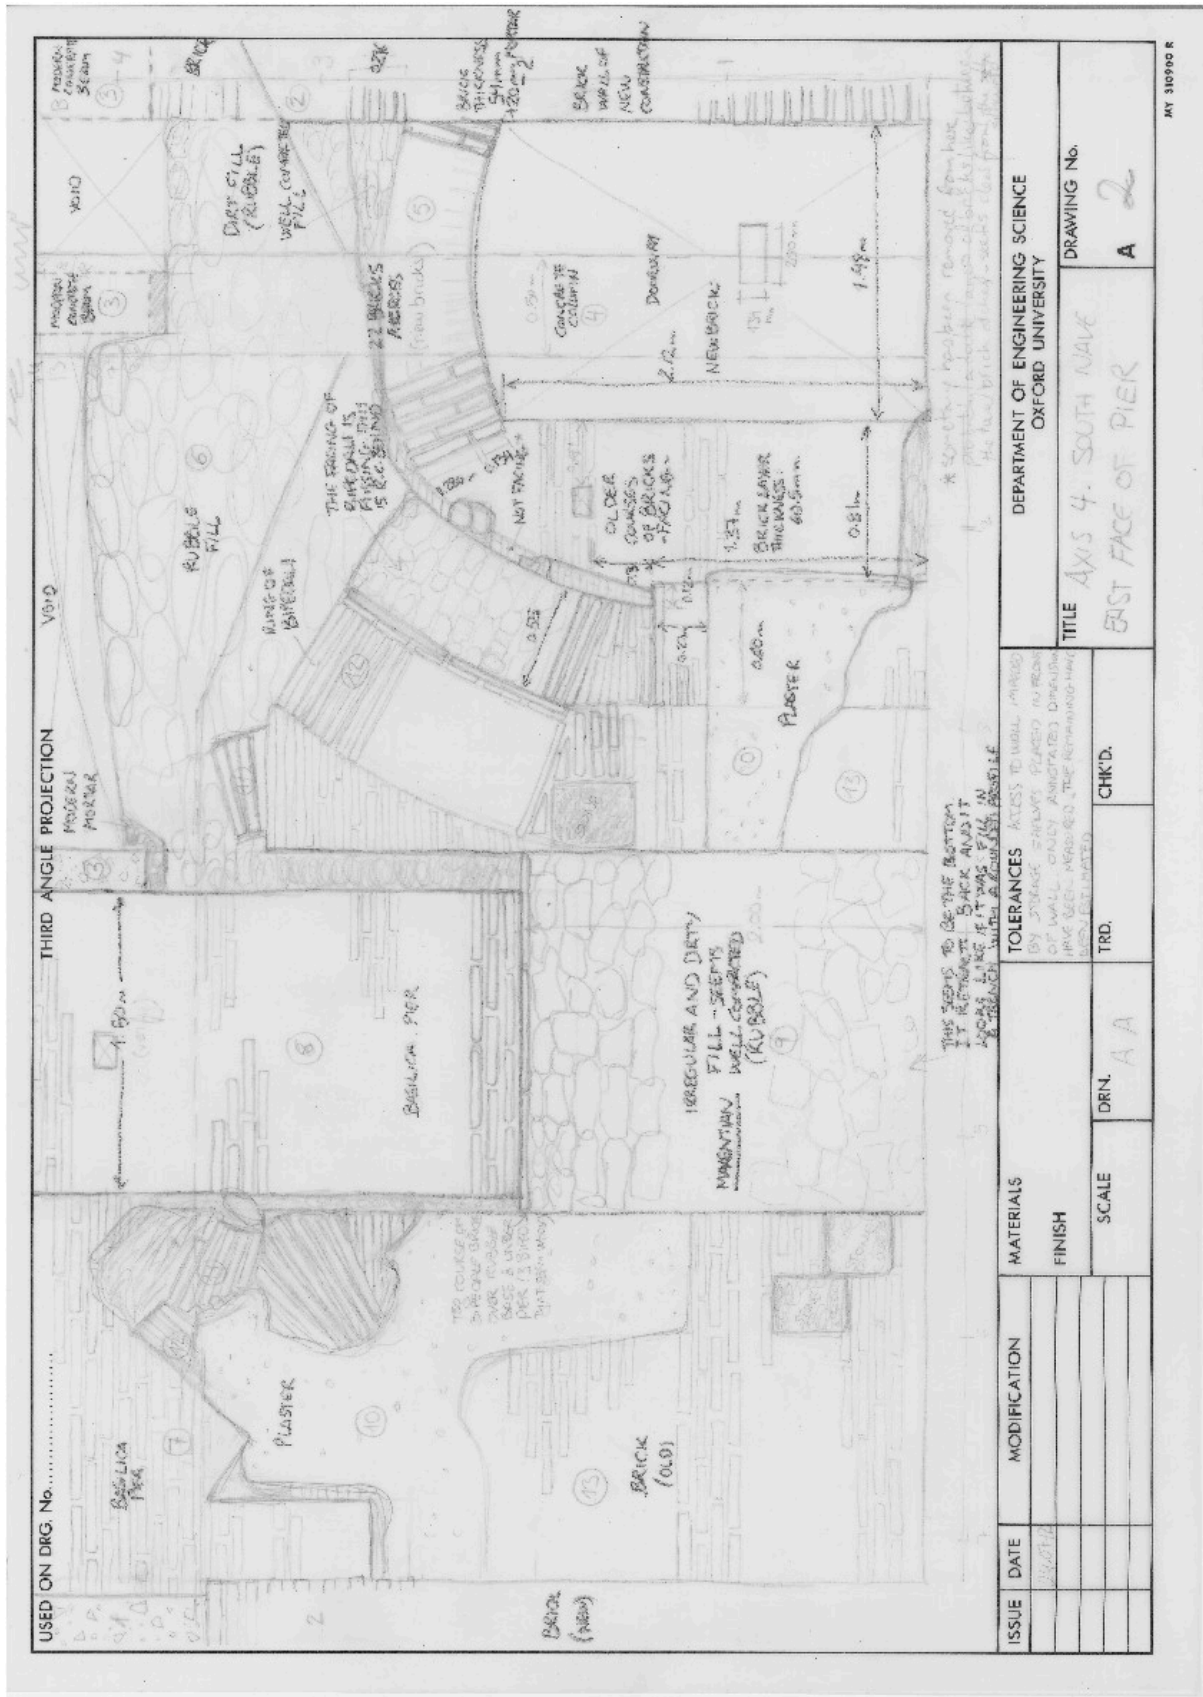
Survey of the internal wall of the west façade, south nave, showing a complex arrangement of Maxentian and earlier elements (Albuerne 2012).
